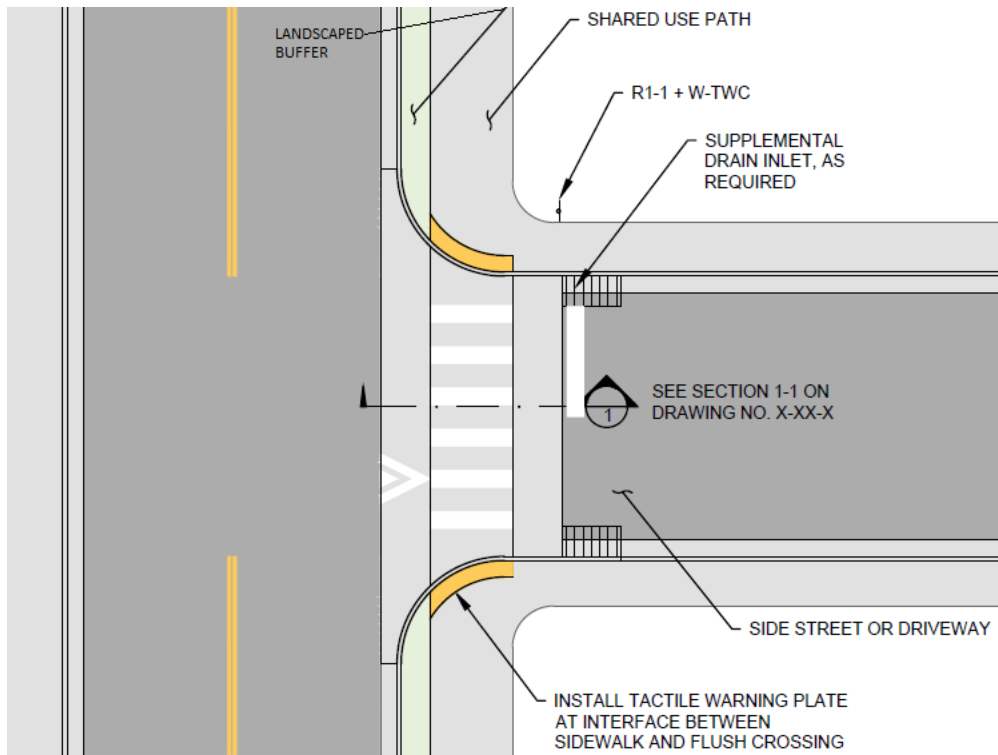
Typical Layout of Raised Crossing at Intersection Leg Location
